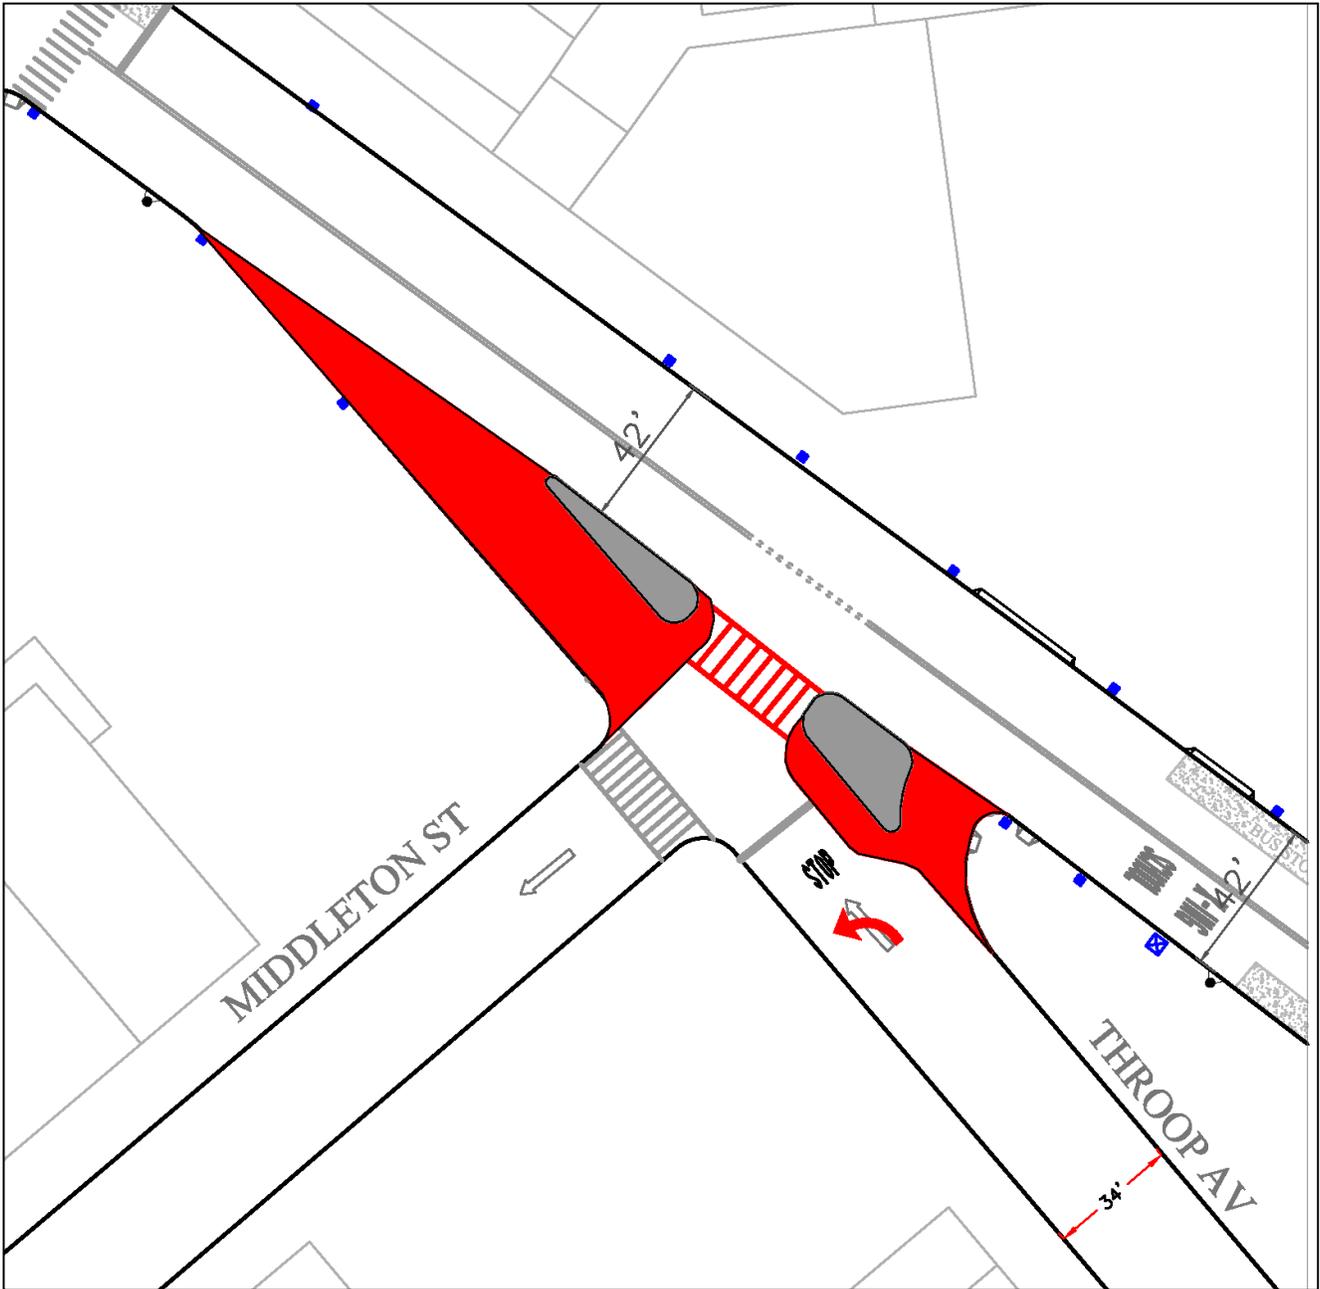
Broadway, Middleton Street and Throop Avenue Proposed Improvements
